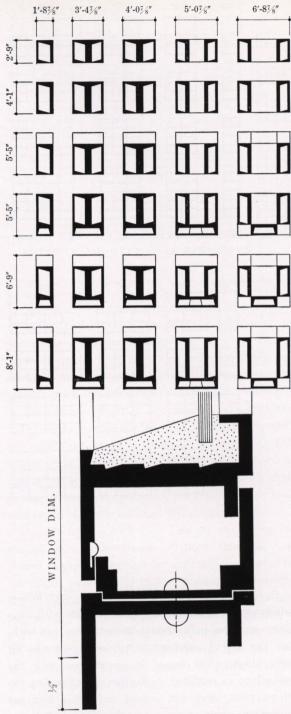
Standard casement windows for commercial and monumental type buildings . . . sizes and typical window sections. Dimensions are window opening. Horizontal and/or vertical muntins may be added, based on 20-inch or 24-inch bar centers for width and 16-inch bar centers for height. Fixed light may be provided at sill in place of sill vents. Fixed types furnished for all sizes shown.
